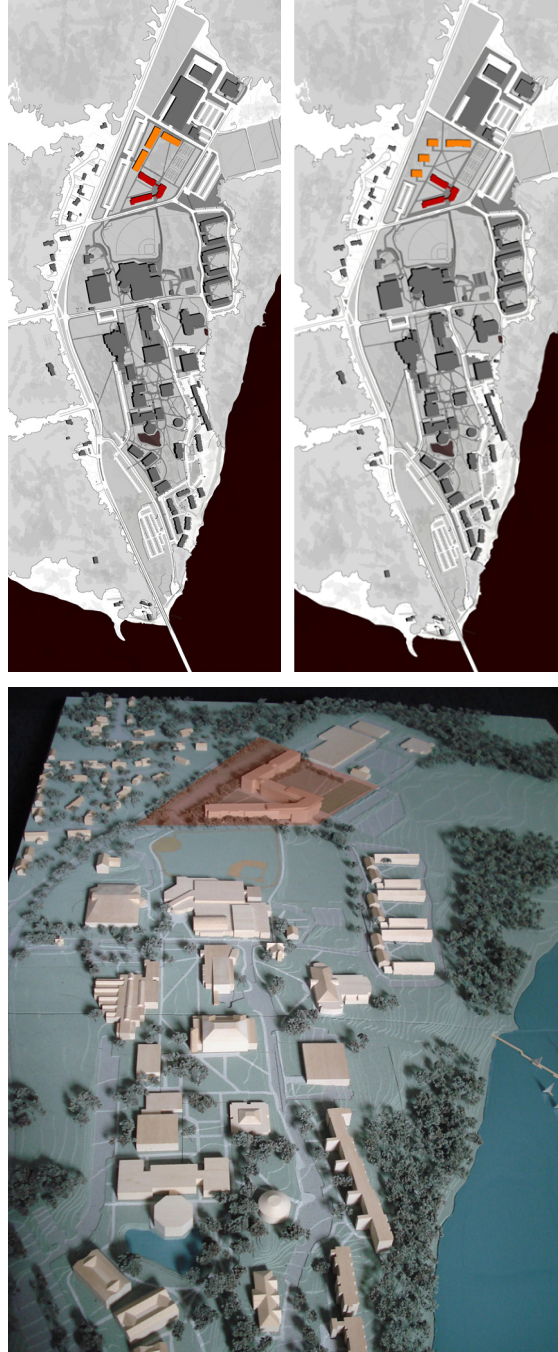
Residence master plan, proposed master plan revisions and campus model indicating site area.
